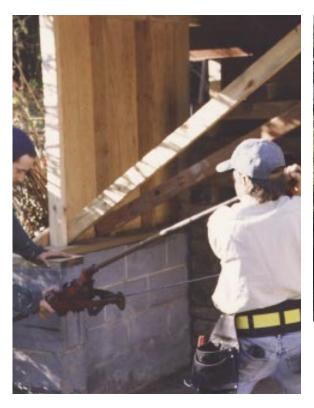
To square up the garage door opening, the completed frame was carefully racked with a come-along (left), and the temporary diagonal bracing shown above was replaced with shorter, permanent braces.
